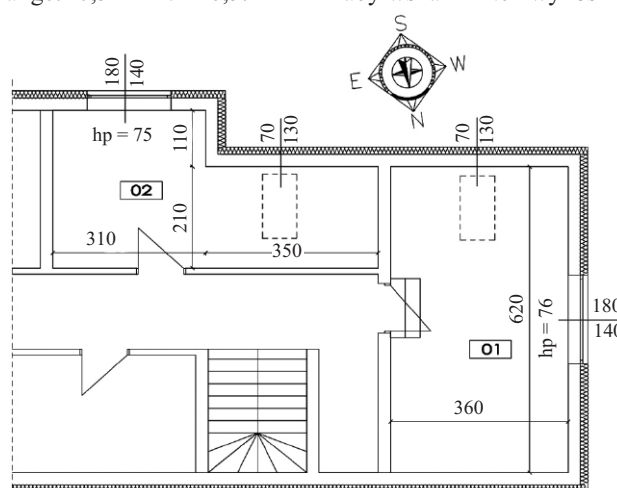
Floor plan of the analysed rooms: 1 – room with clay-based plaster; 2 – room with cement-lime plaster
